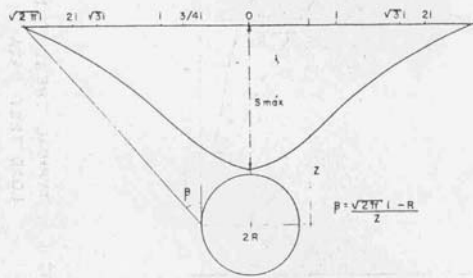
DEFORMATION IN TUNNELS (PECK 69)
